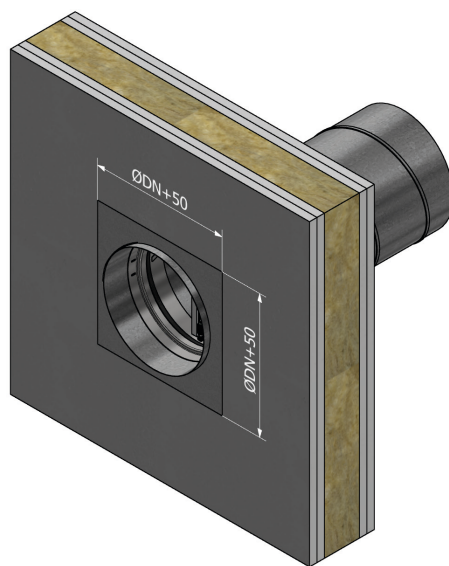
Installation of the FDA-BU damper in a plasterboard wall.
